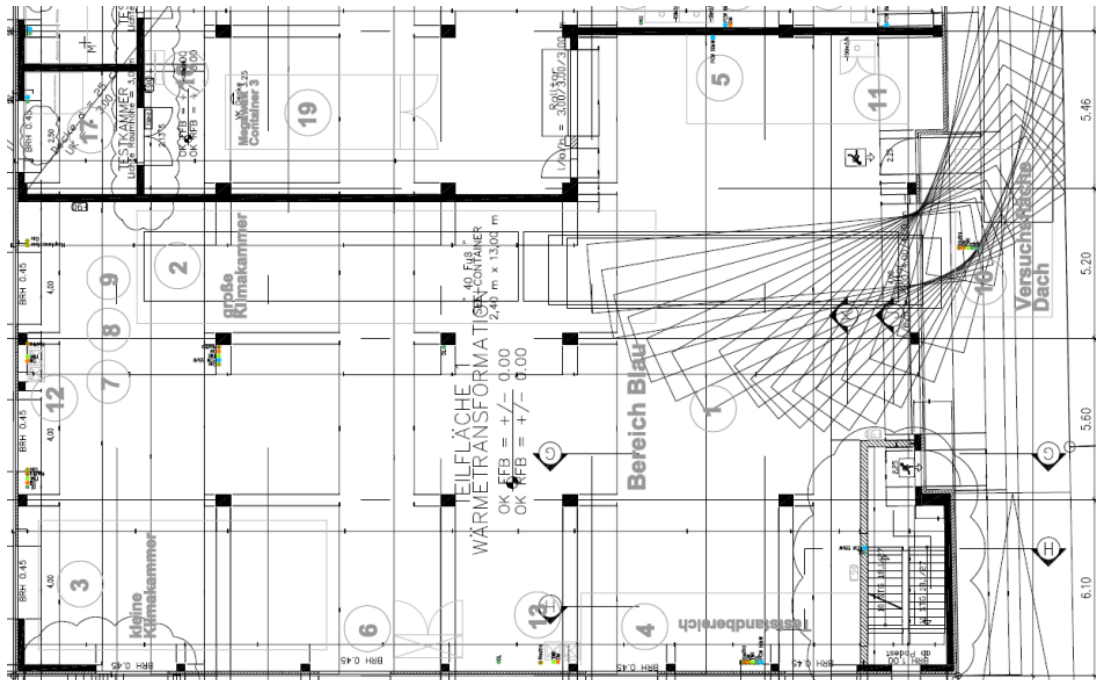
Floor plan of the Centre for Heating and Cooling Technologies
